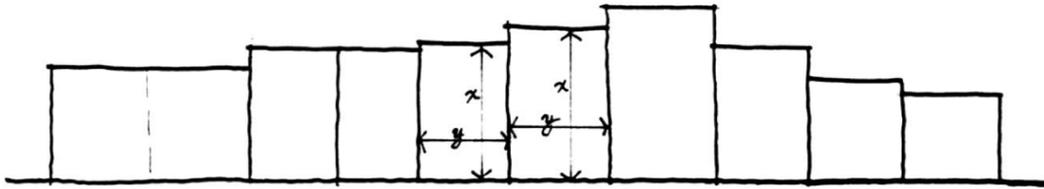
Building Width Articulation Example, Stillwater Design Manual, 2006.
